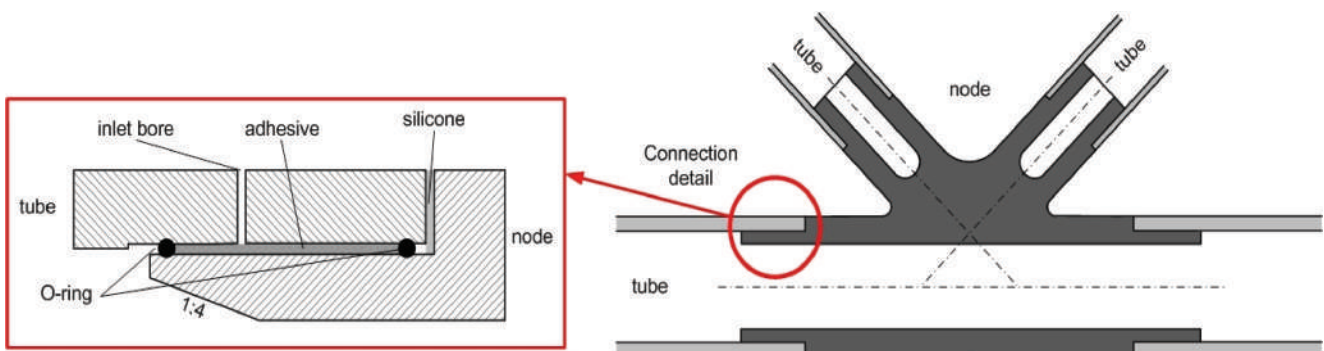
Potential connection detail with cast steel elements and adhesive joints. (Figure courtesy of Professor Thomas Ummenhofer)
